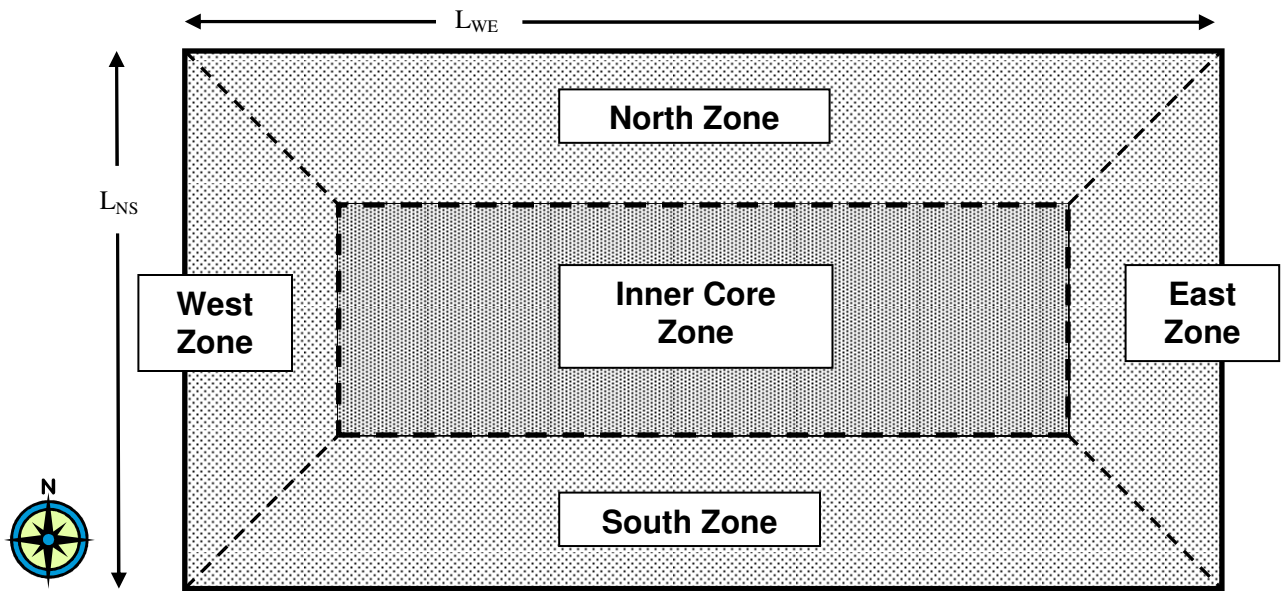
Plan view of building divided into 5 subsections: four directional façades and an interior core.
